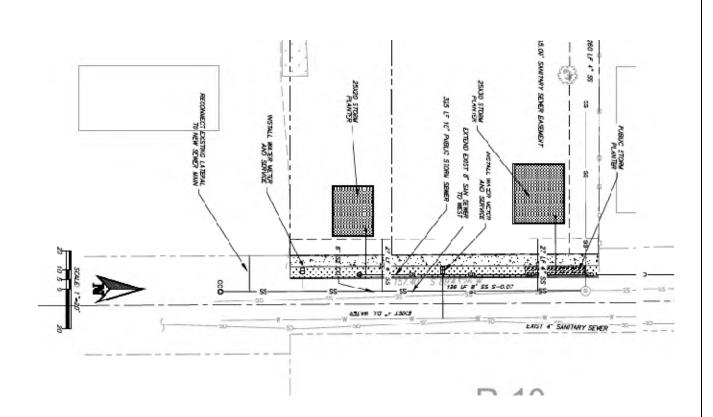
Drainage Plan – Frontage and 2 and 3 Lots
